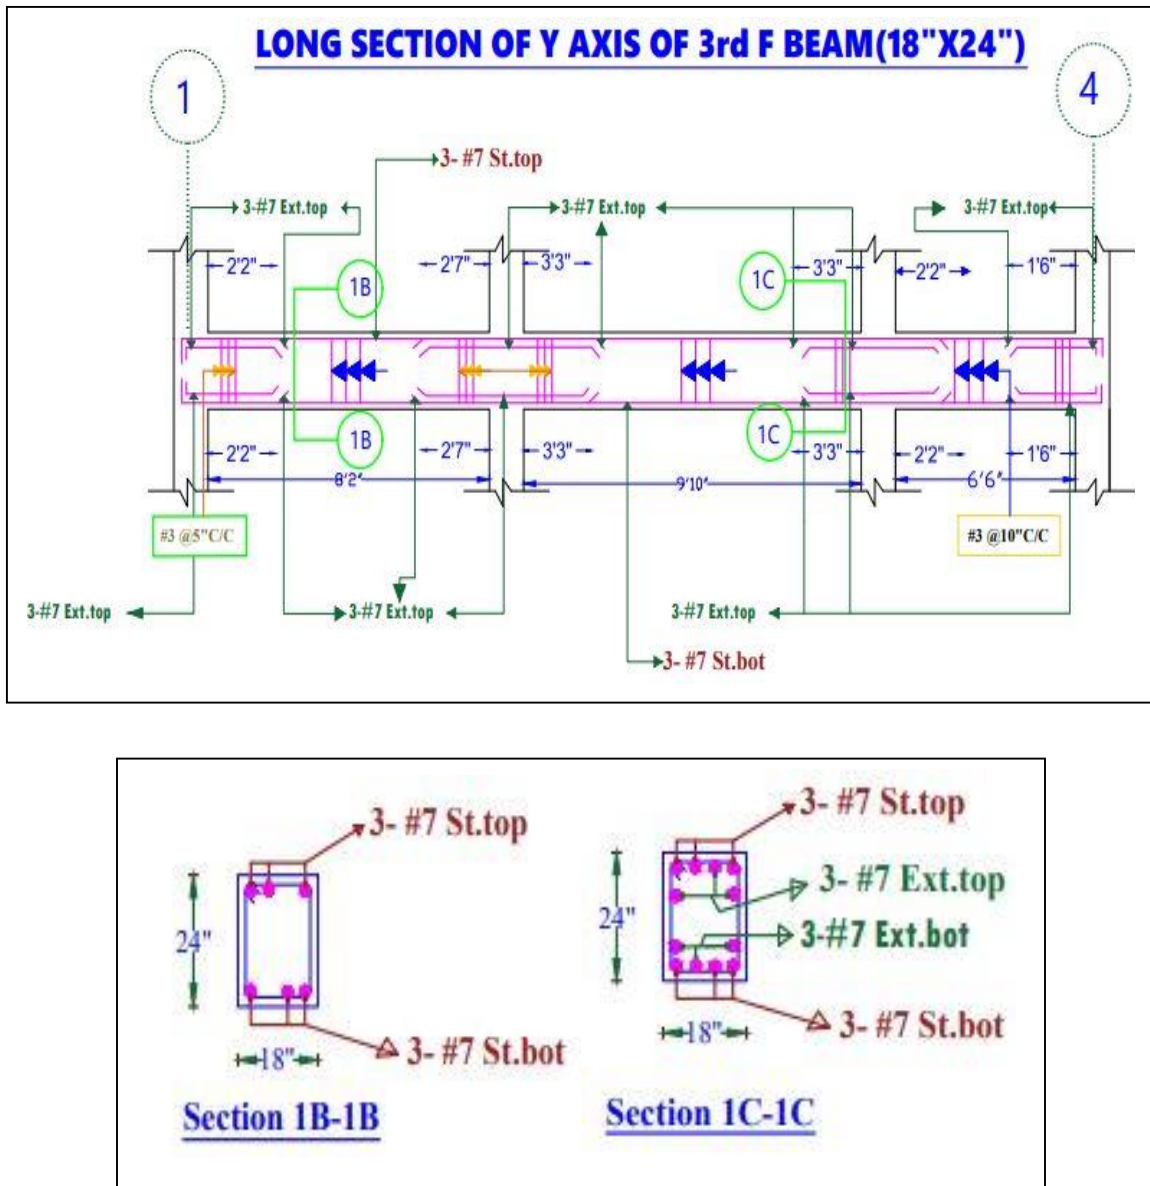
Beam Detailing & Cross Section of Y-axis
